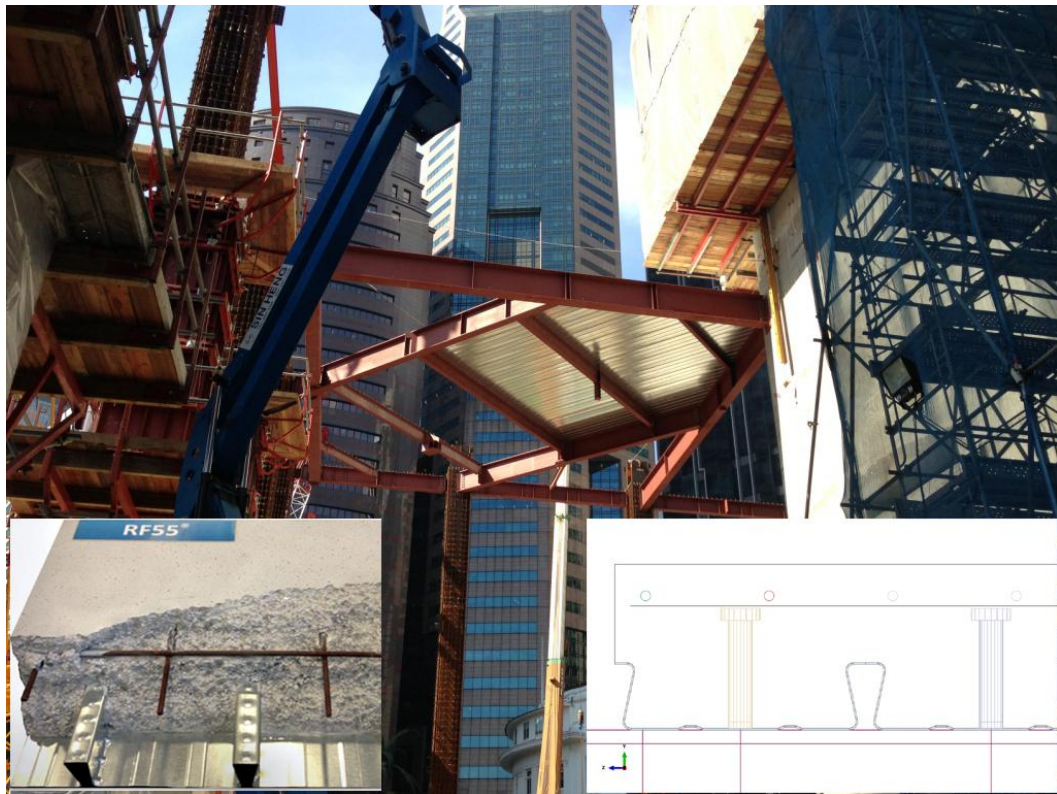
Installation of RF55® deck in high-rise steel framed building and the cross-section of the steel-concrete composite slab showing the shear studs (right) and mesh reinforcement embedded in the concrete.
